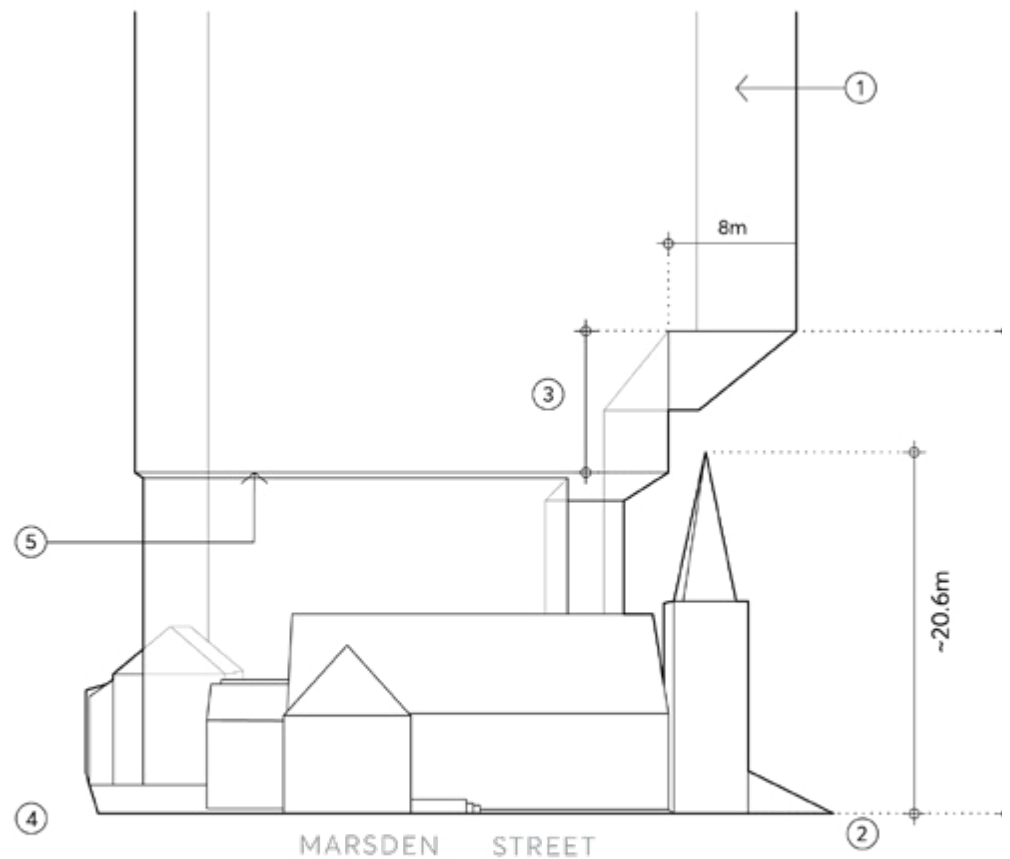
Maximum building envelope – Ground plane from Phillip Street NTS
